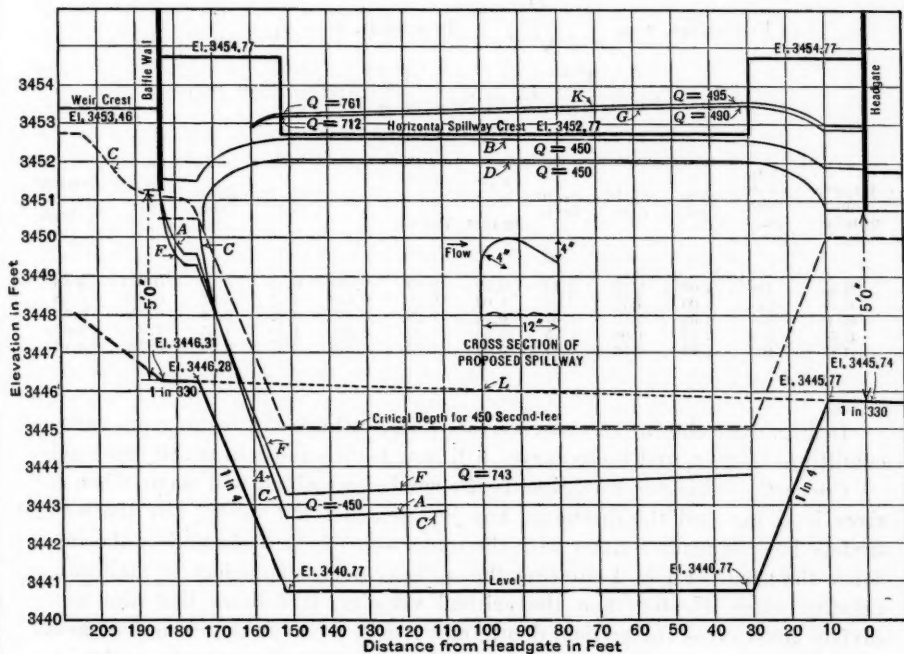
PROPOSED DESIGN FOR HEAD-WORKS. DIAGRAMMATIC SECTION ON CENTER LINE.
